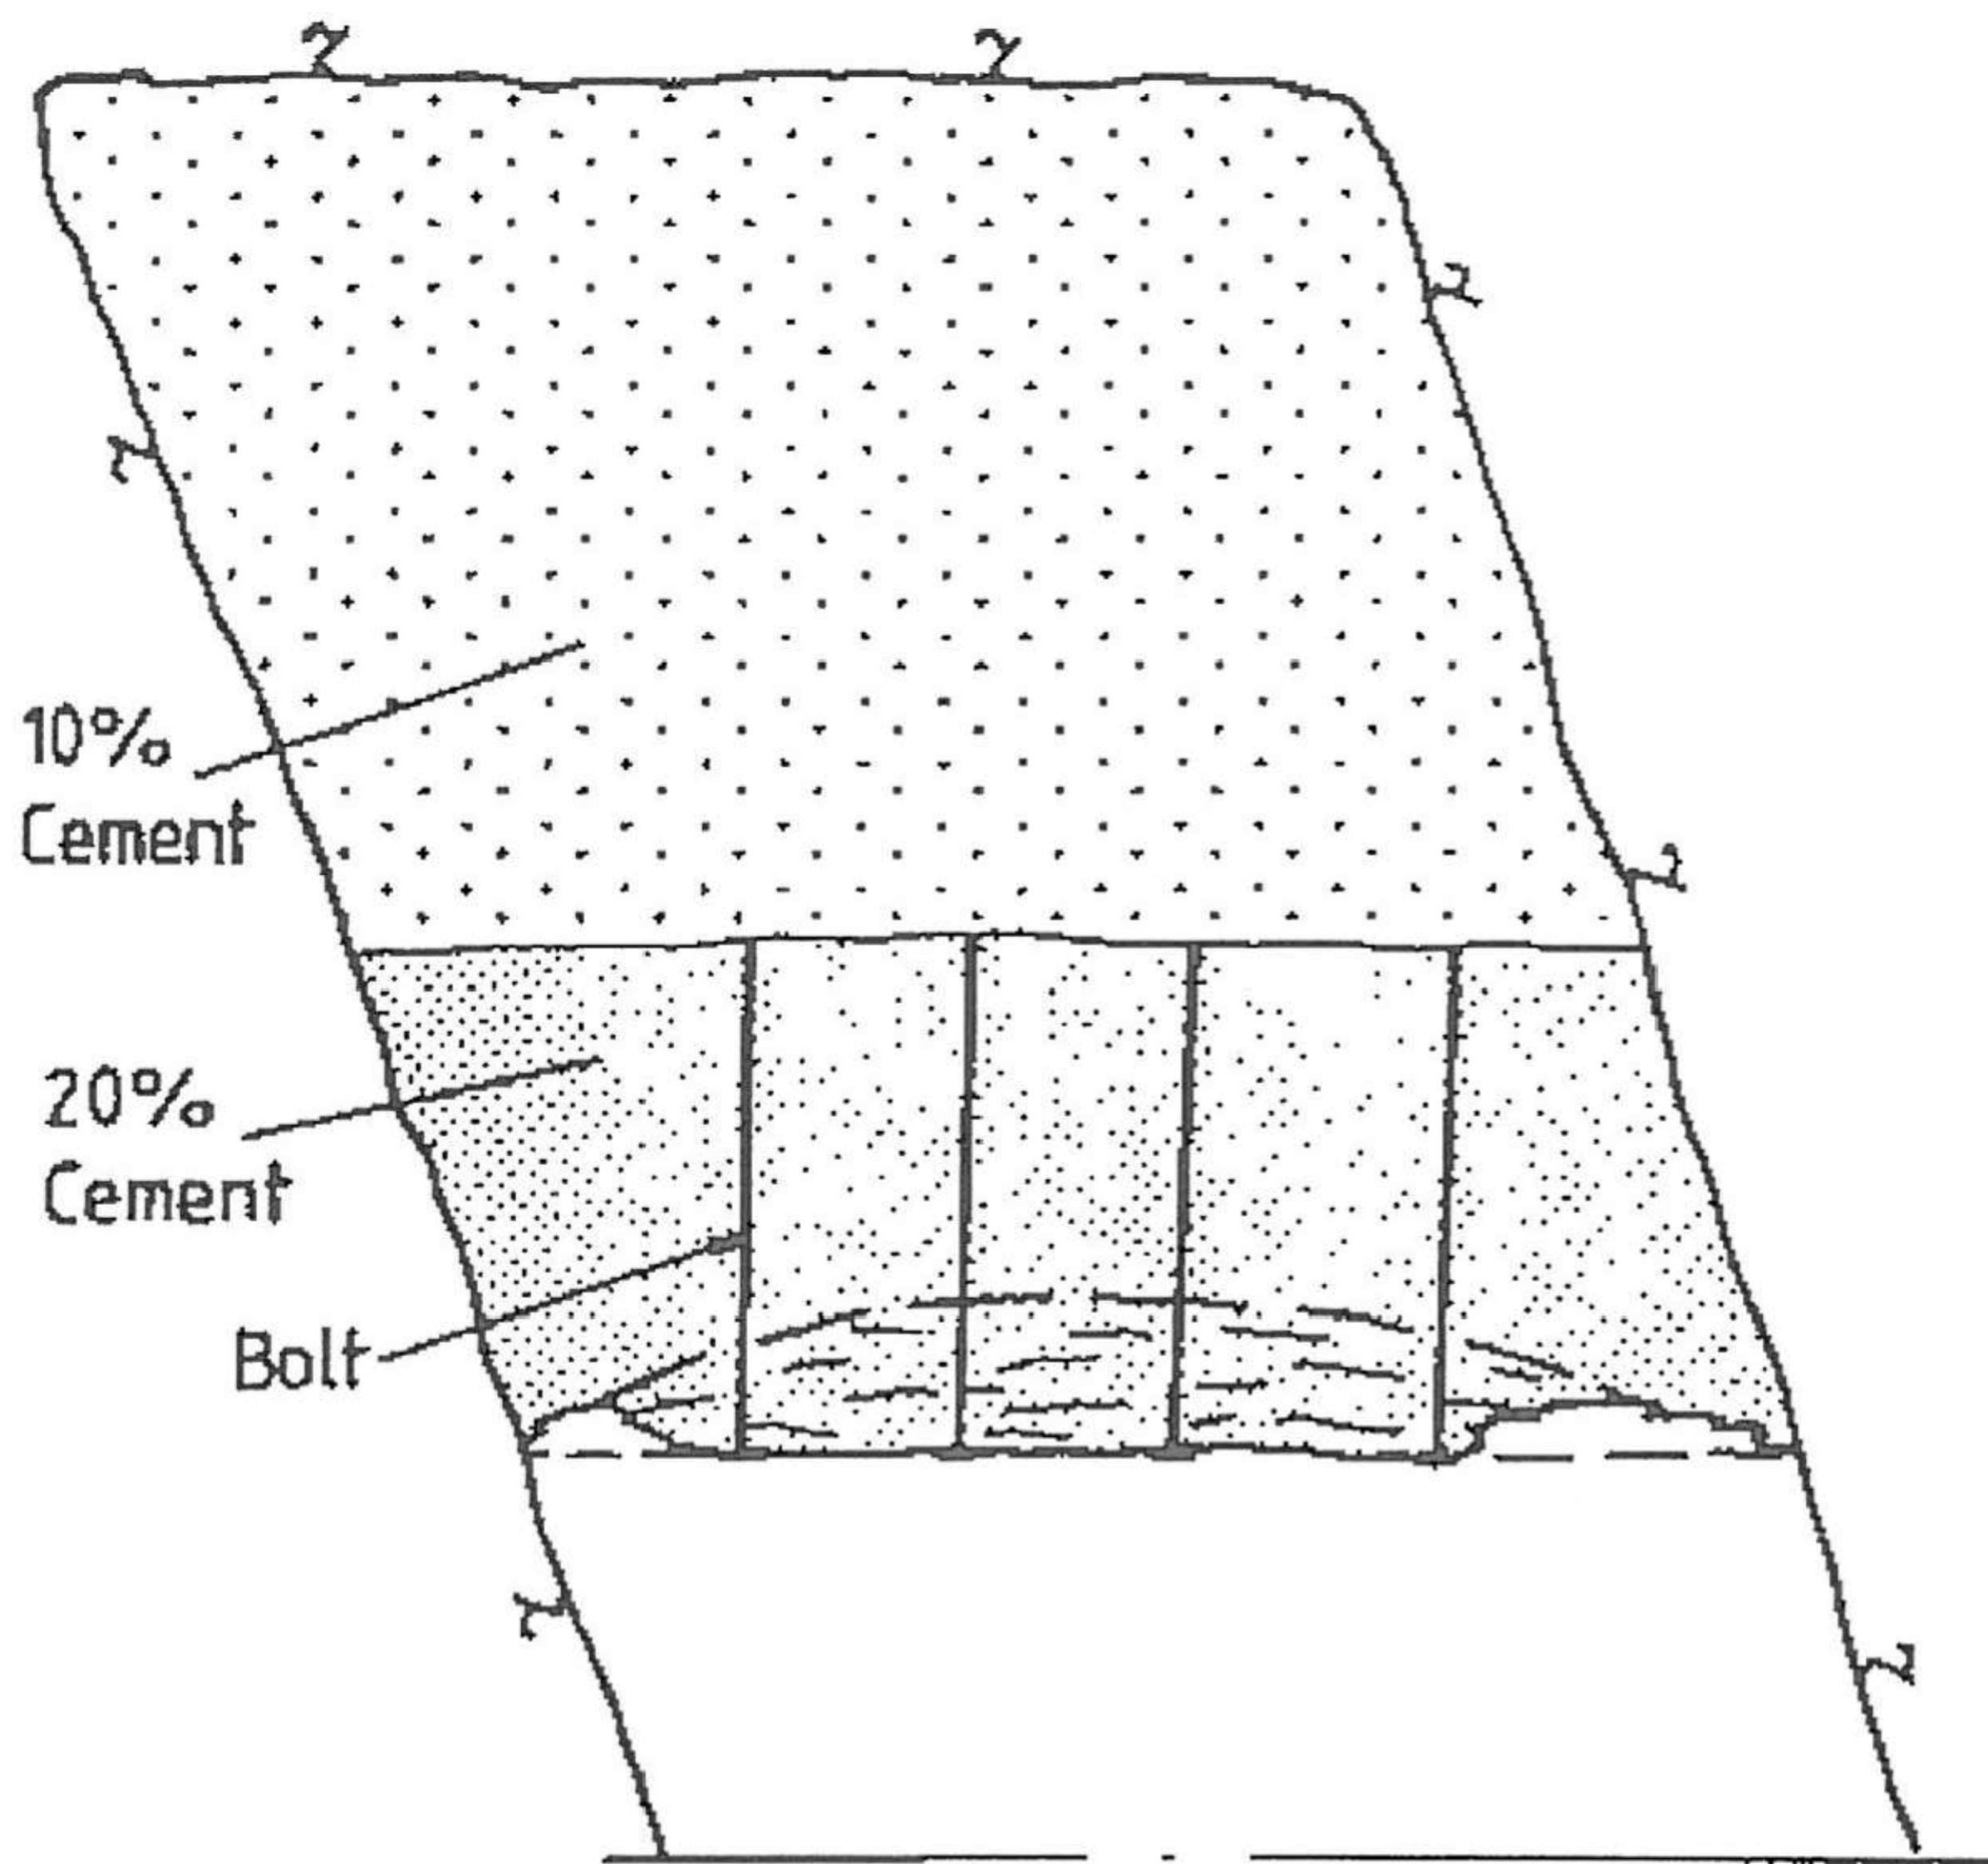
Failure of a fill roof due to convergence in the narrow sections
